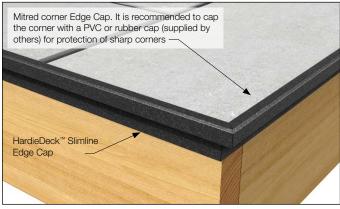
EDGE CAPPING MITRED CORNER DETAIL
